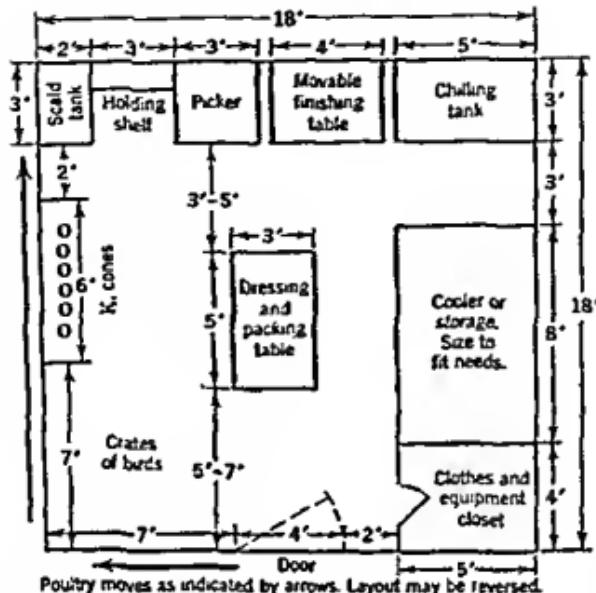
Killing, dressing, and cooling room. A suggested guide for placing equipment.
